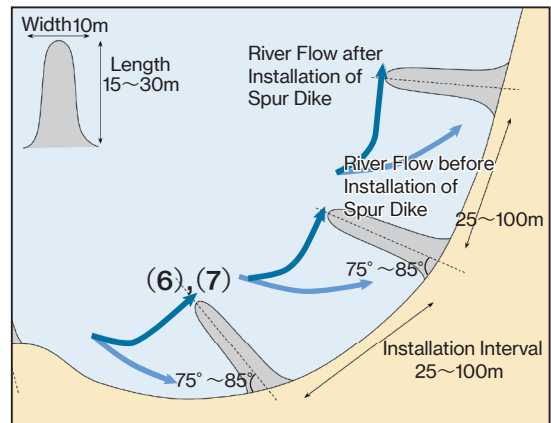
Construction Example of Dike/Stone Spur Dike ²⁾, see 3)
